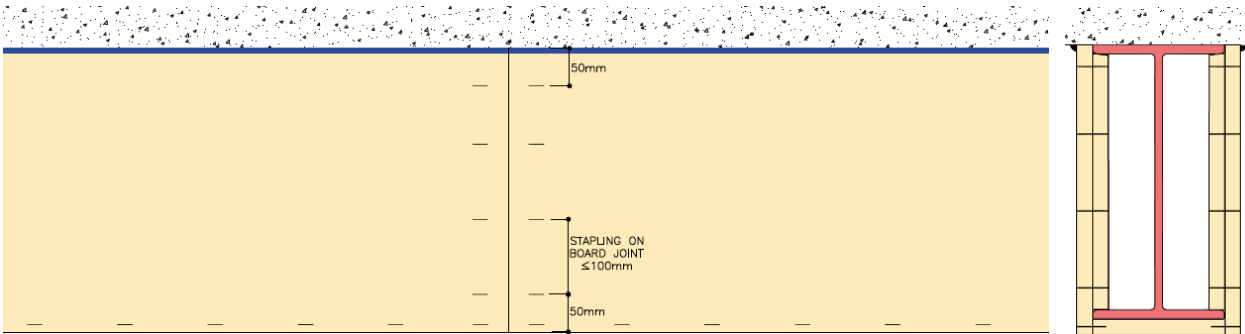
Elevation and cross-section view of Universal Steel Beam, showing completion of Knauf Fireboard installed
